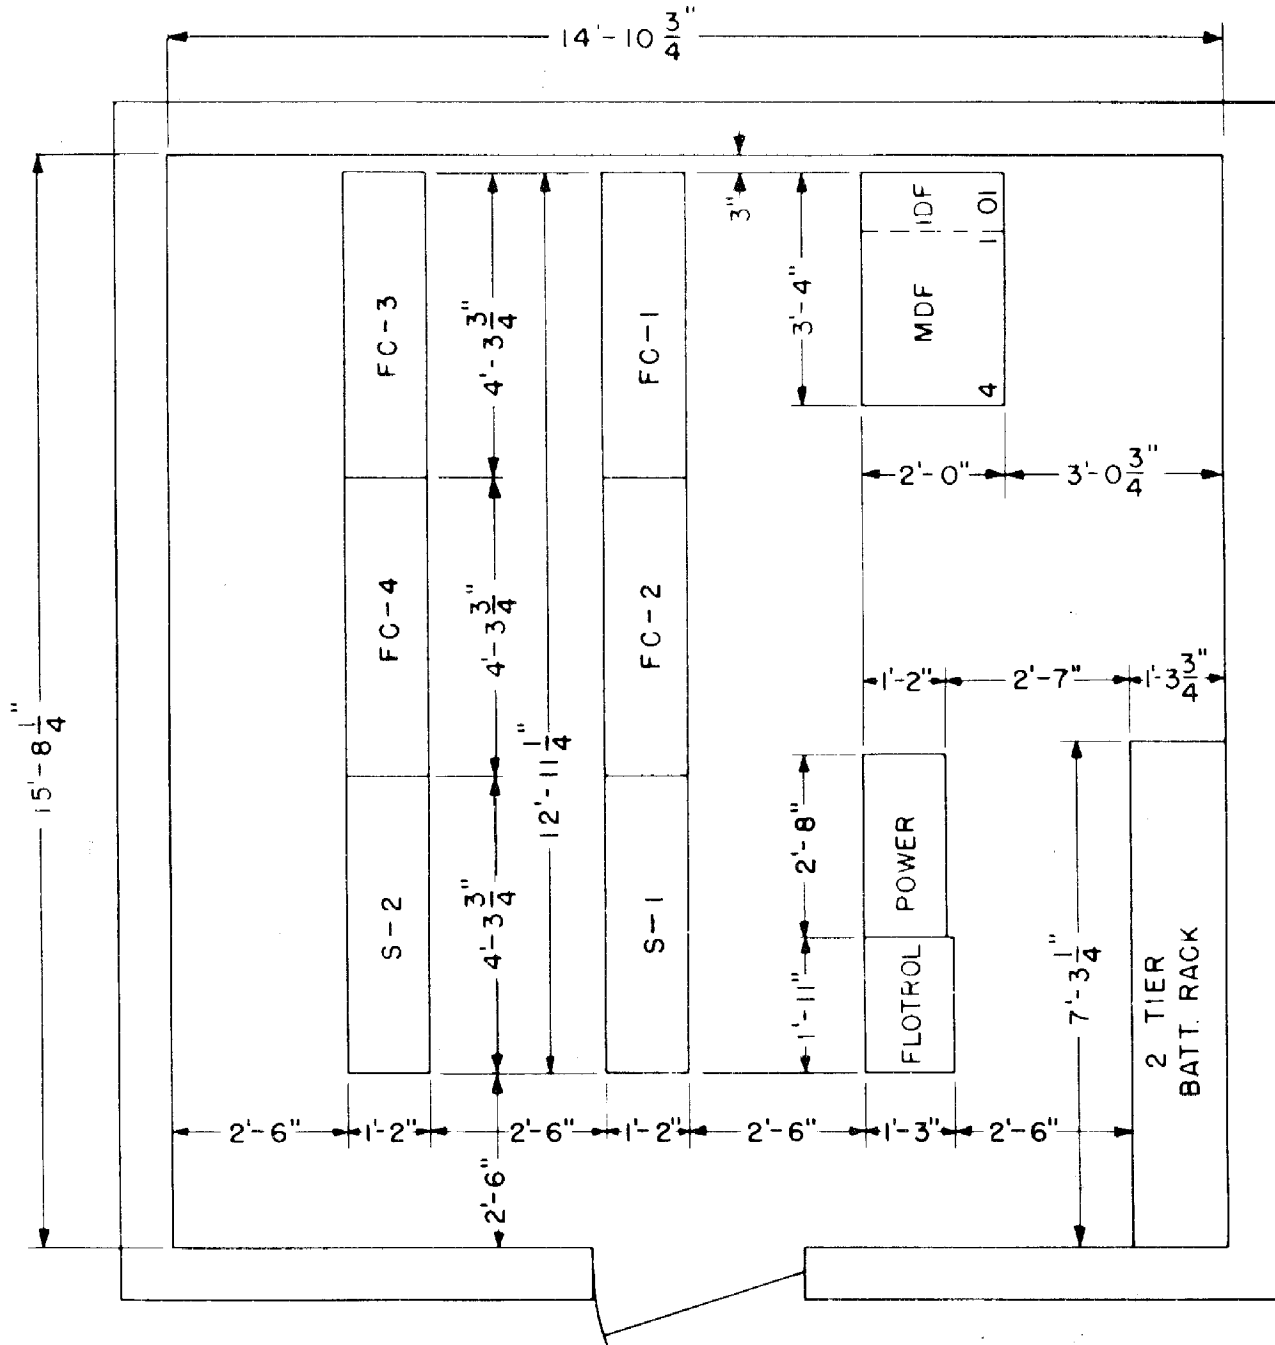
ILLUSTRATES A TYPICAL FLOOR PLAN FOR A 400 LINE 7-2. CROSSBAR TERMINAL PER LINE INSTALLATION INCLUDING POWER AND MAIN FRAME.
